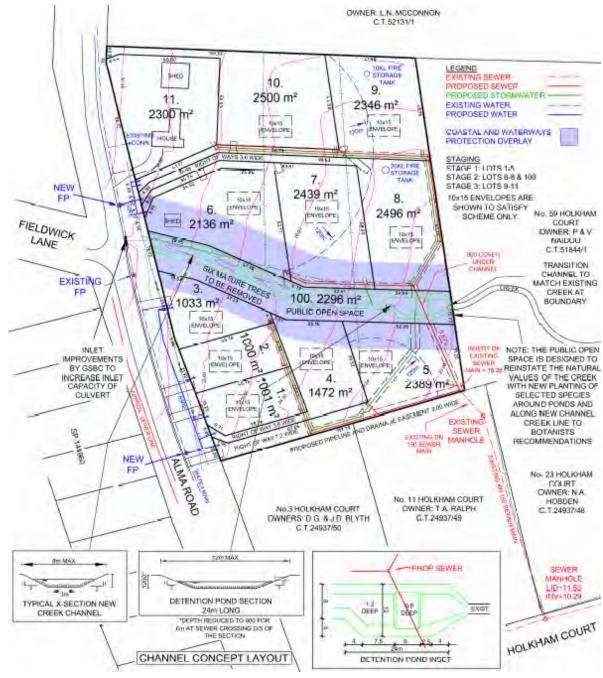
Plan of Subdivision (source: Nick Griggs & Co.)
